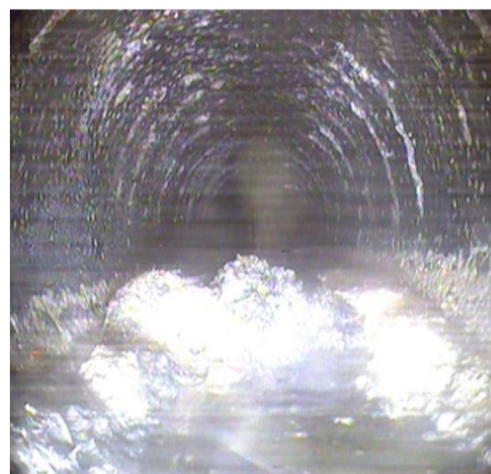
Facing robot with large deposit during sewer pipe inspection
